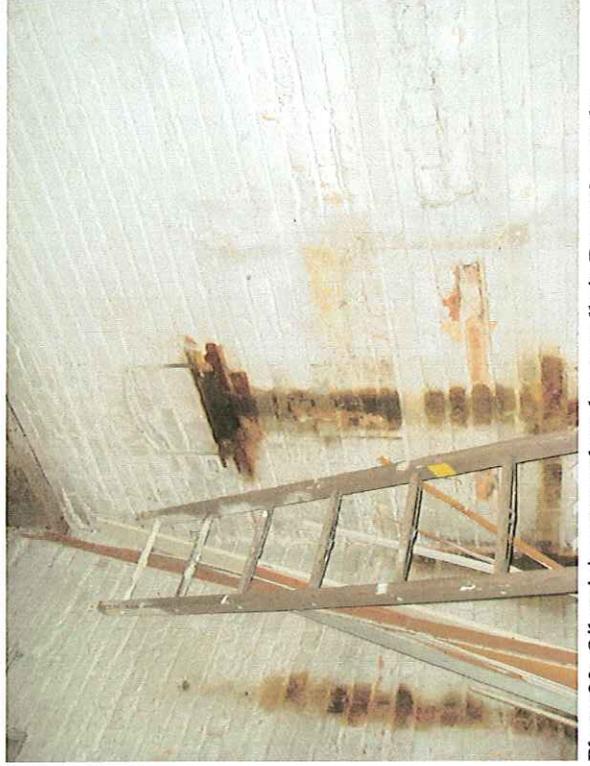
Oil staining on north and east walls in Room 2 near the northeast corner of the room.
